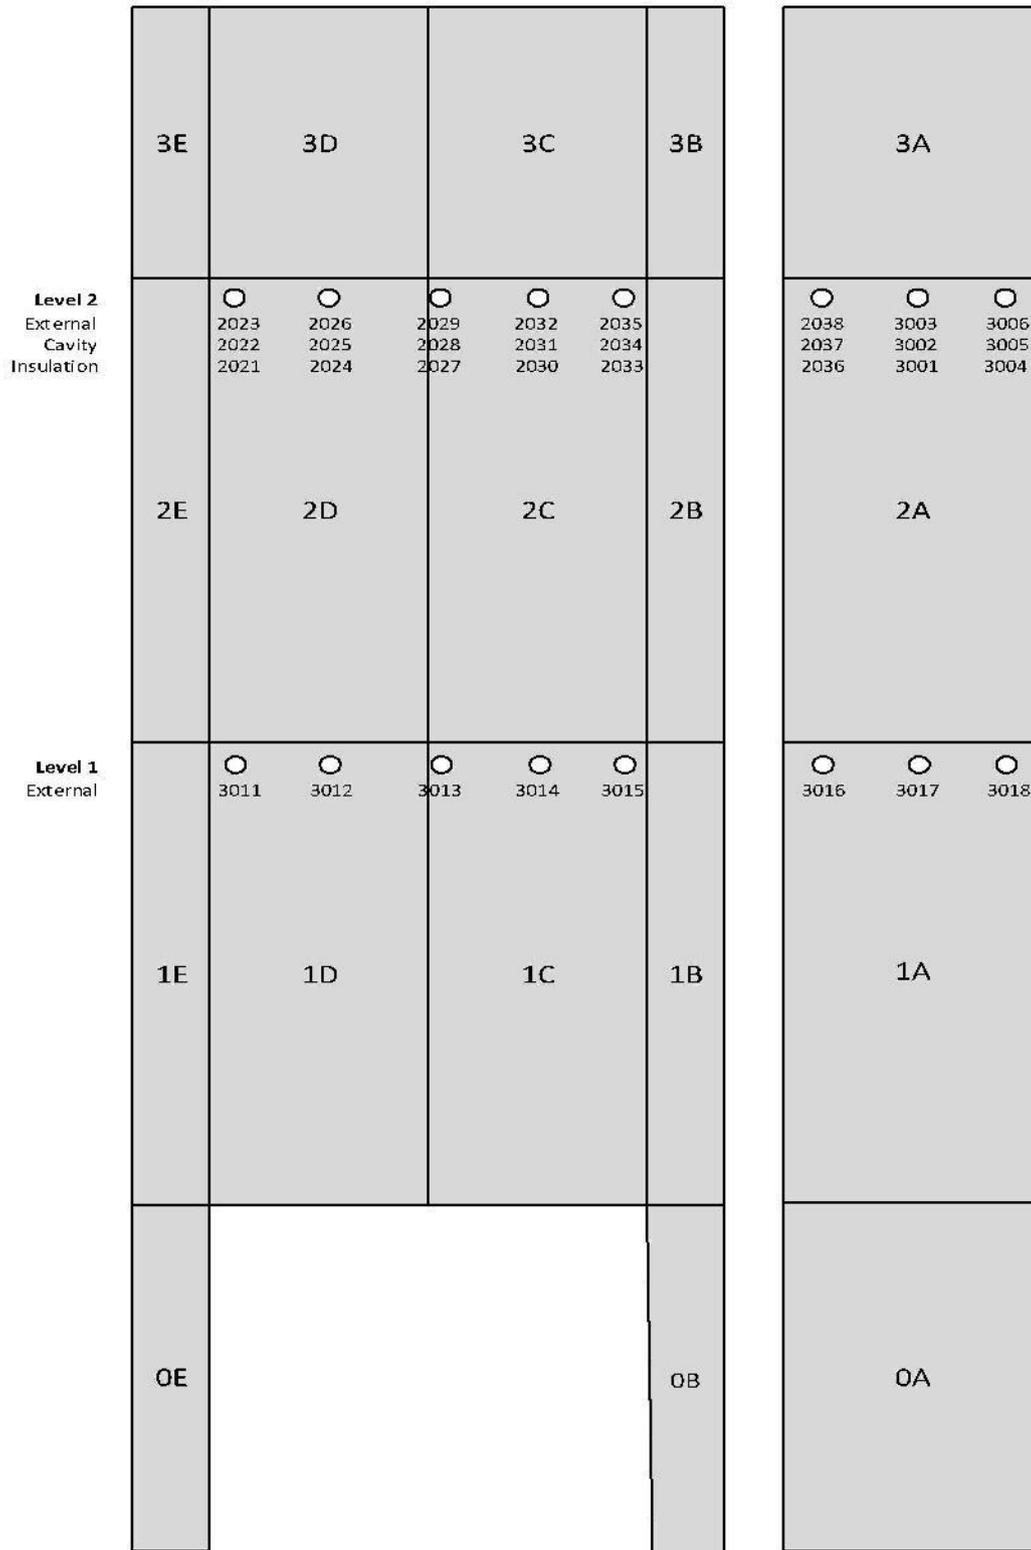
TC positions and panel labelling system (0A – 3E). Not to scale.
